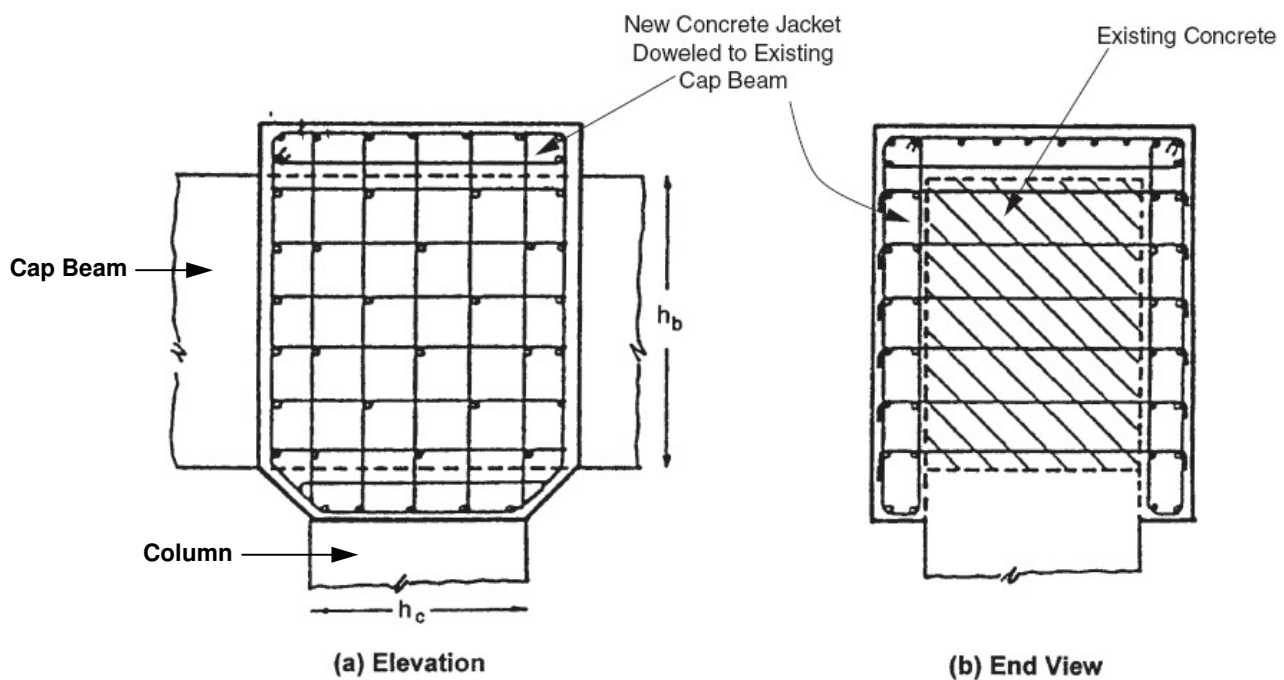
Joint retrofit with external concrete jacket (Adapted from FHWA-SRM, 2005)
